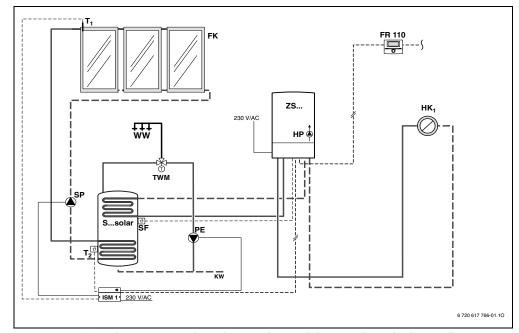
FR 110 and CDi System Boiler with optional integral diverter valve and solar installation.
